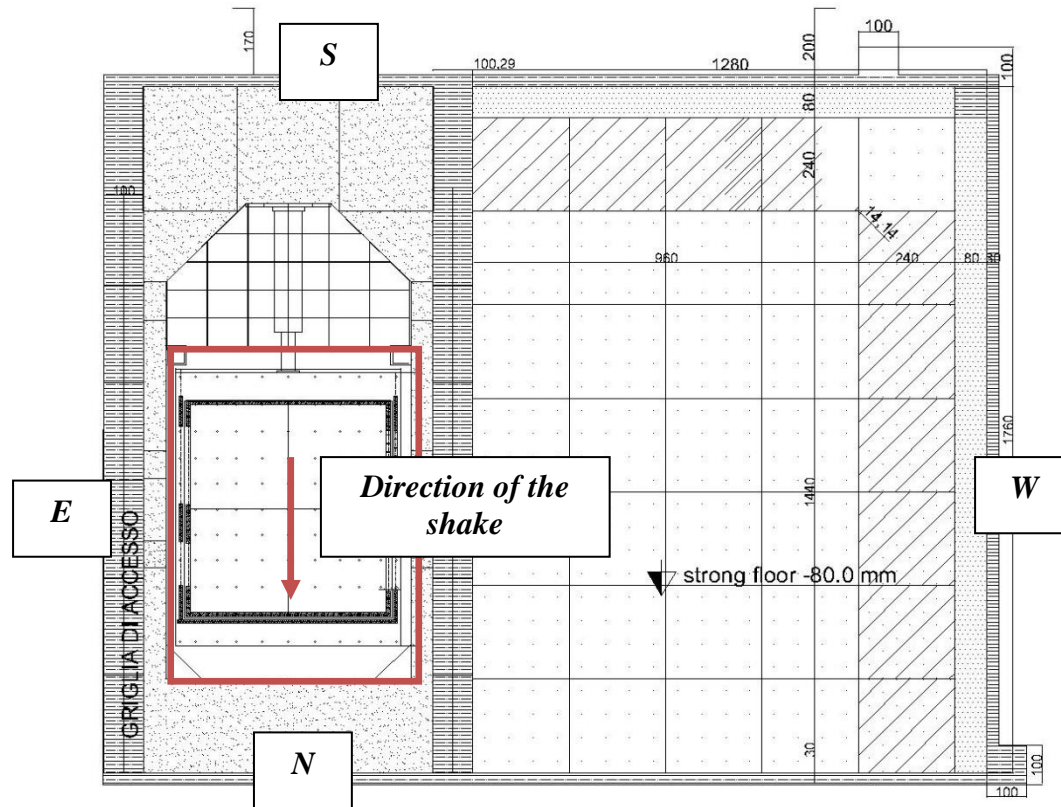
Plan view of the Eucentre Lab. and position of the shake-table and the walls of the test-house
